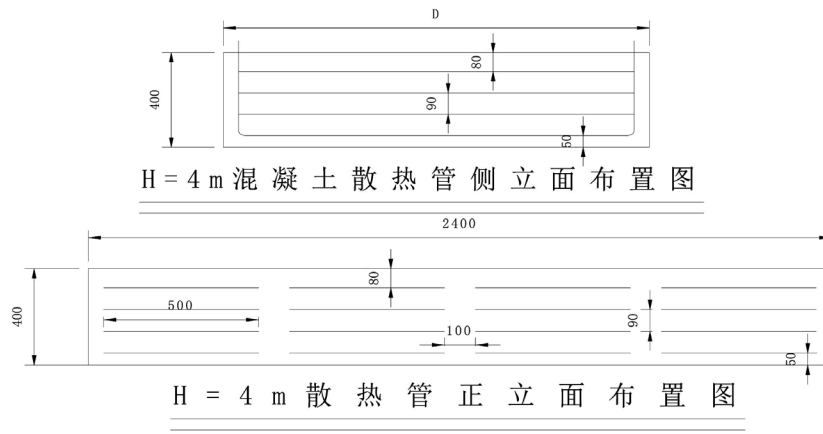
Layout graph of 4 meters storey height concrete cooling tubes
